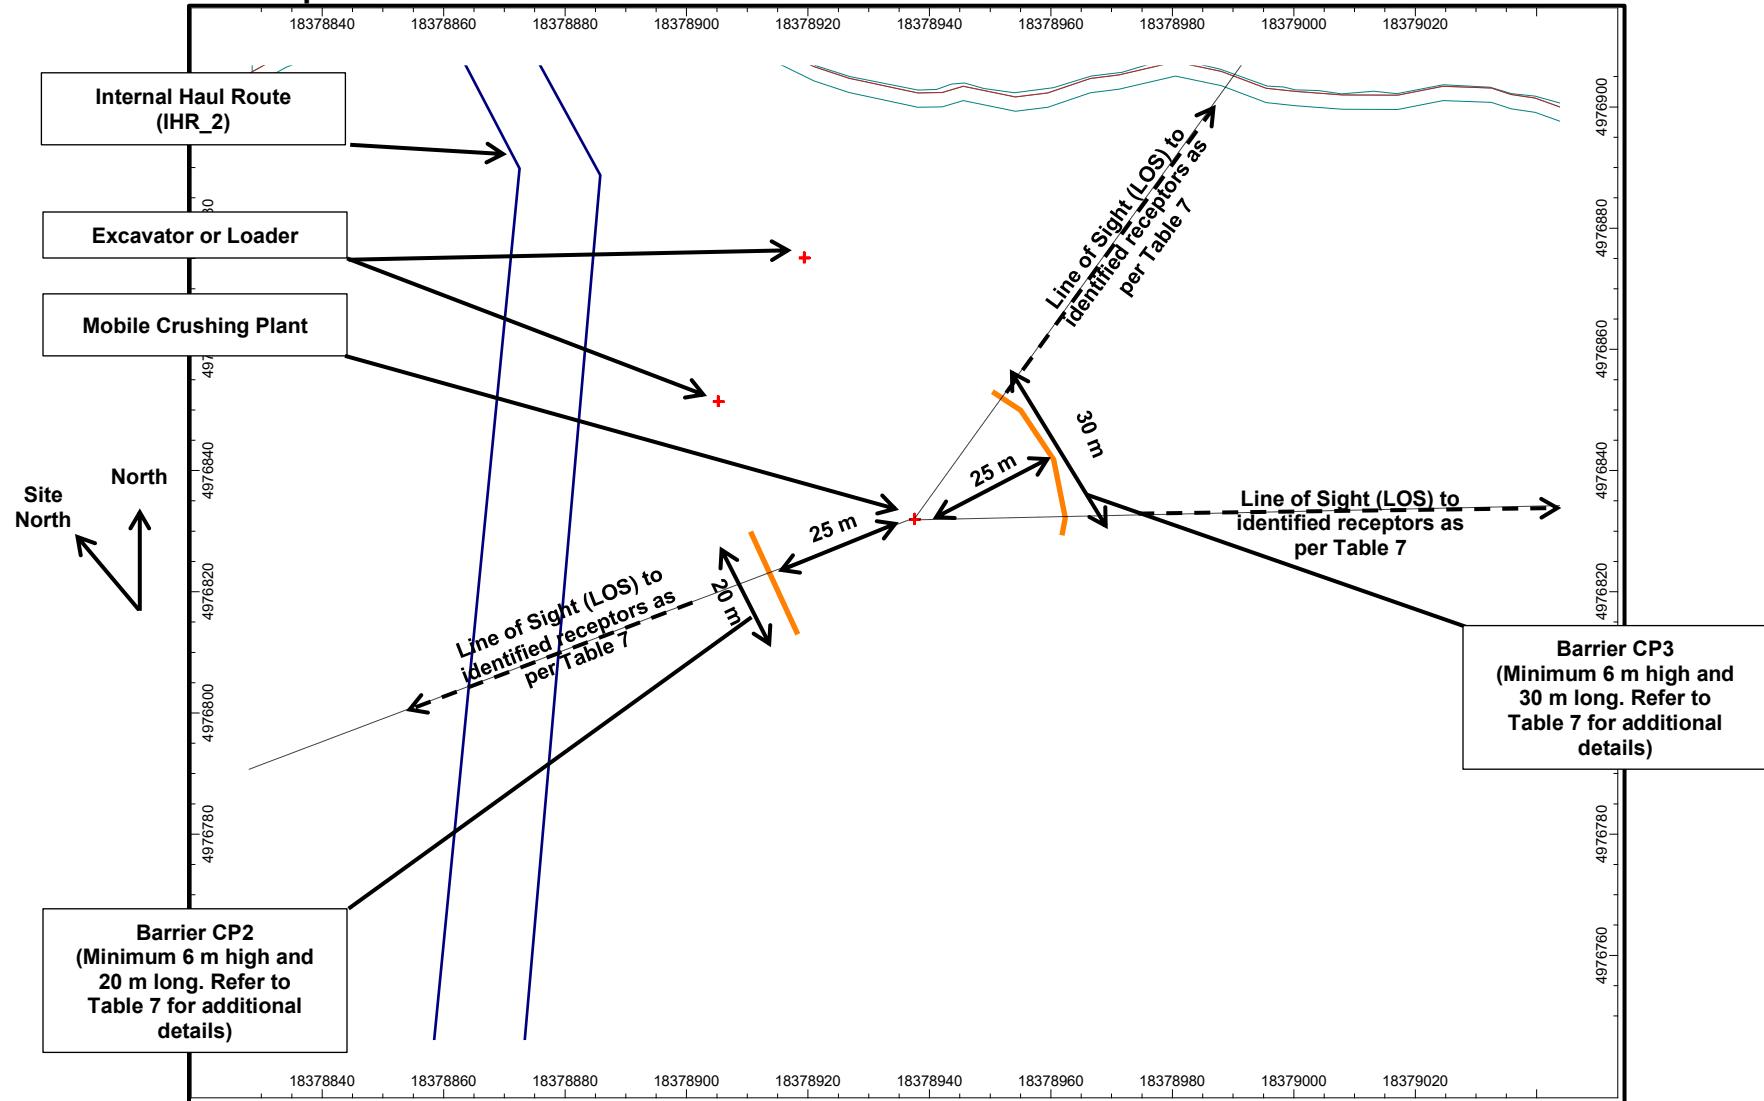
Detail plan at Mobile Crushing Plant showing location of noise barriers (stockpiles) when operation in Extraction Area 2
